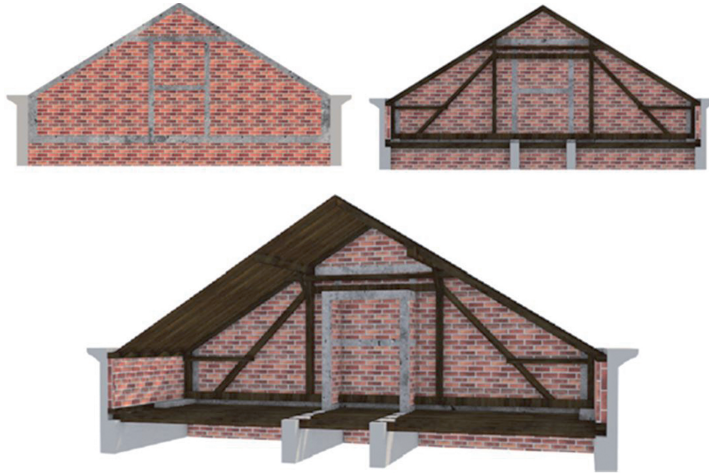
Proposed reconstruction of the damaged gable wall with the use of reinforced concrete frames with brick infill walls [12]
